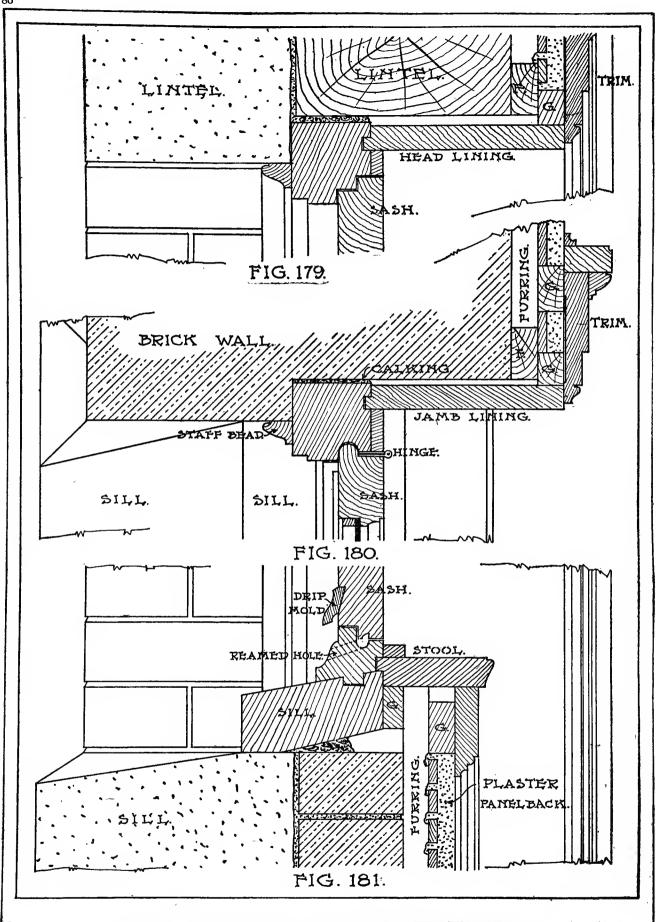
STORM-PROOF INWARD OPENING CASEMENT
